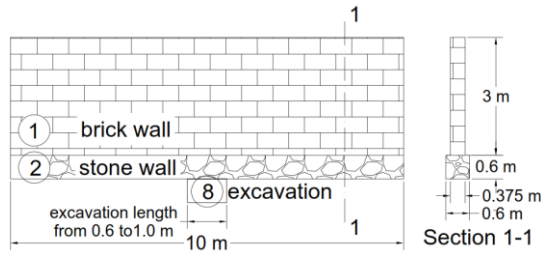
Detail of the excavation, with the wall and corresponding foundation
